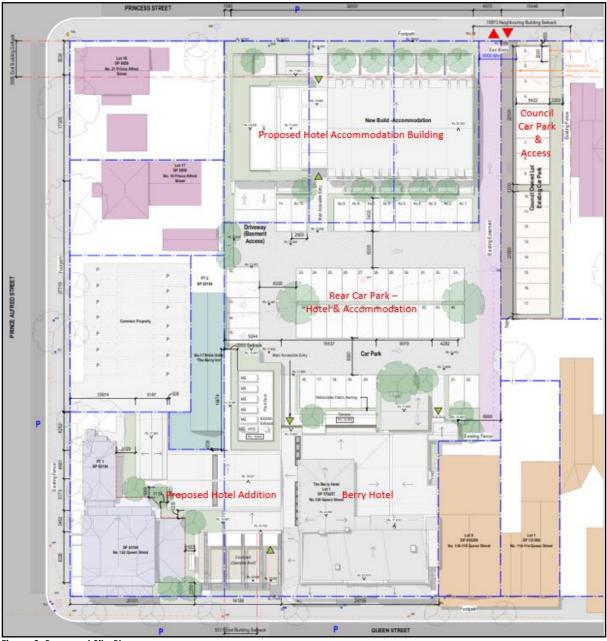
Proposed Site Plan Source: H&E Architects; annotated by DC
